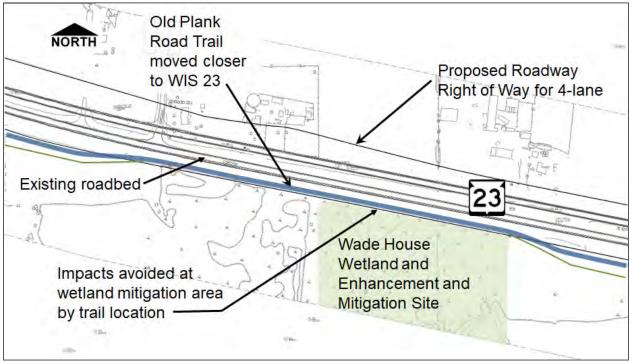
Wade House Historic Site Wetland Enhancement and Mitigation Site
